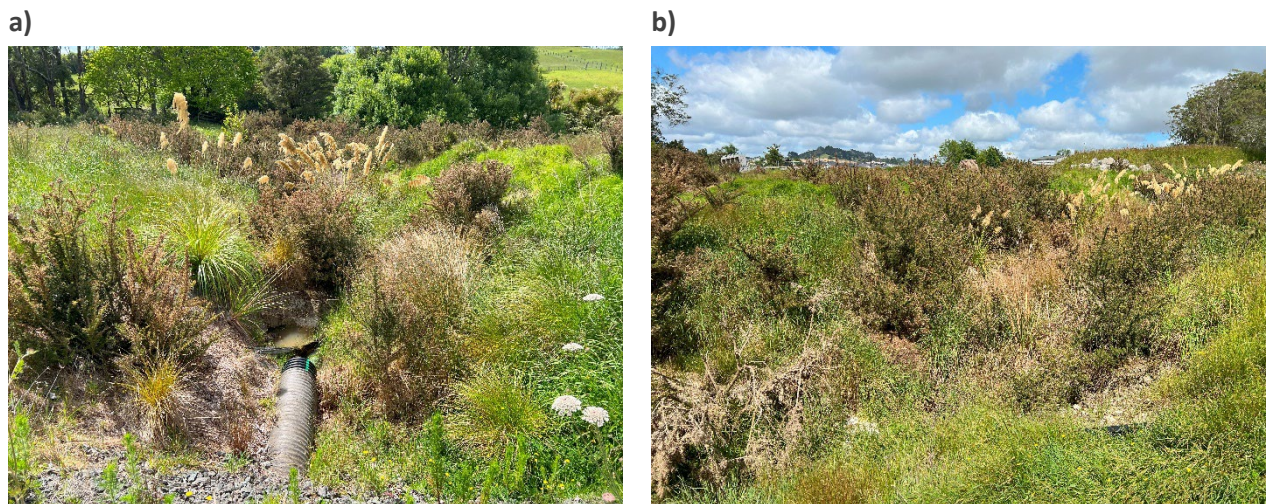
a) Downstream culvert facing towards Waterloo Creek, and b) the limited riparian vegetation downstream of the culvert, showing patches of gorse and planted native grasses and sedges.
